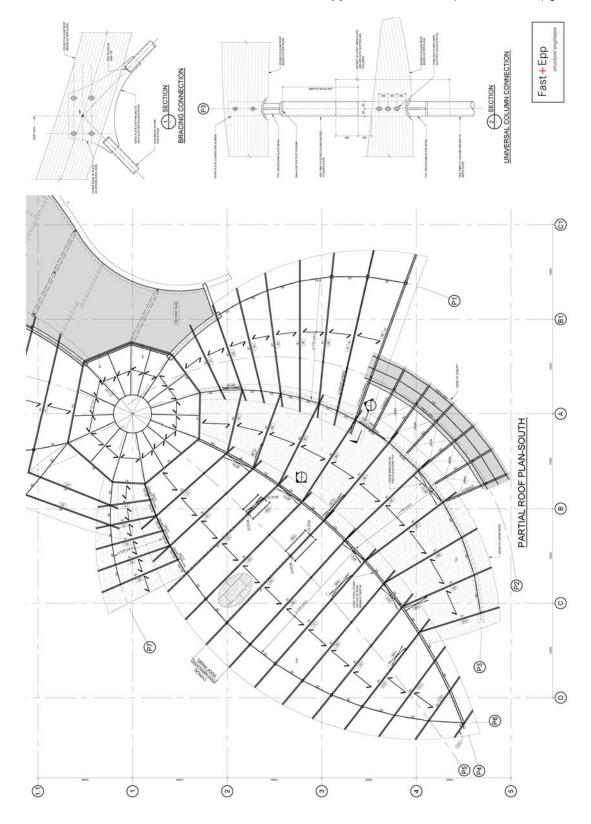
Partial roof plan showing the simplicity of trapezoidal shaped panel layout to achieve complex roof form. Credit: Fast + Epp
